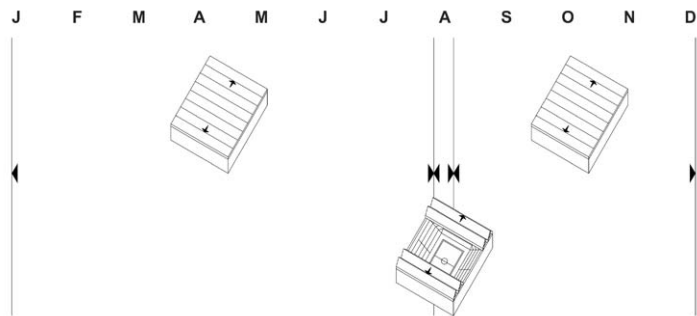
Demonstration of roof structure movement in buildings with primarily closed roofs that are opened only in special cases (annual opening and closing).
